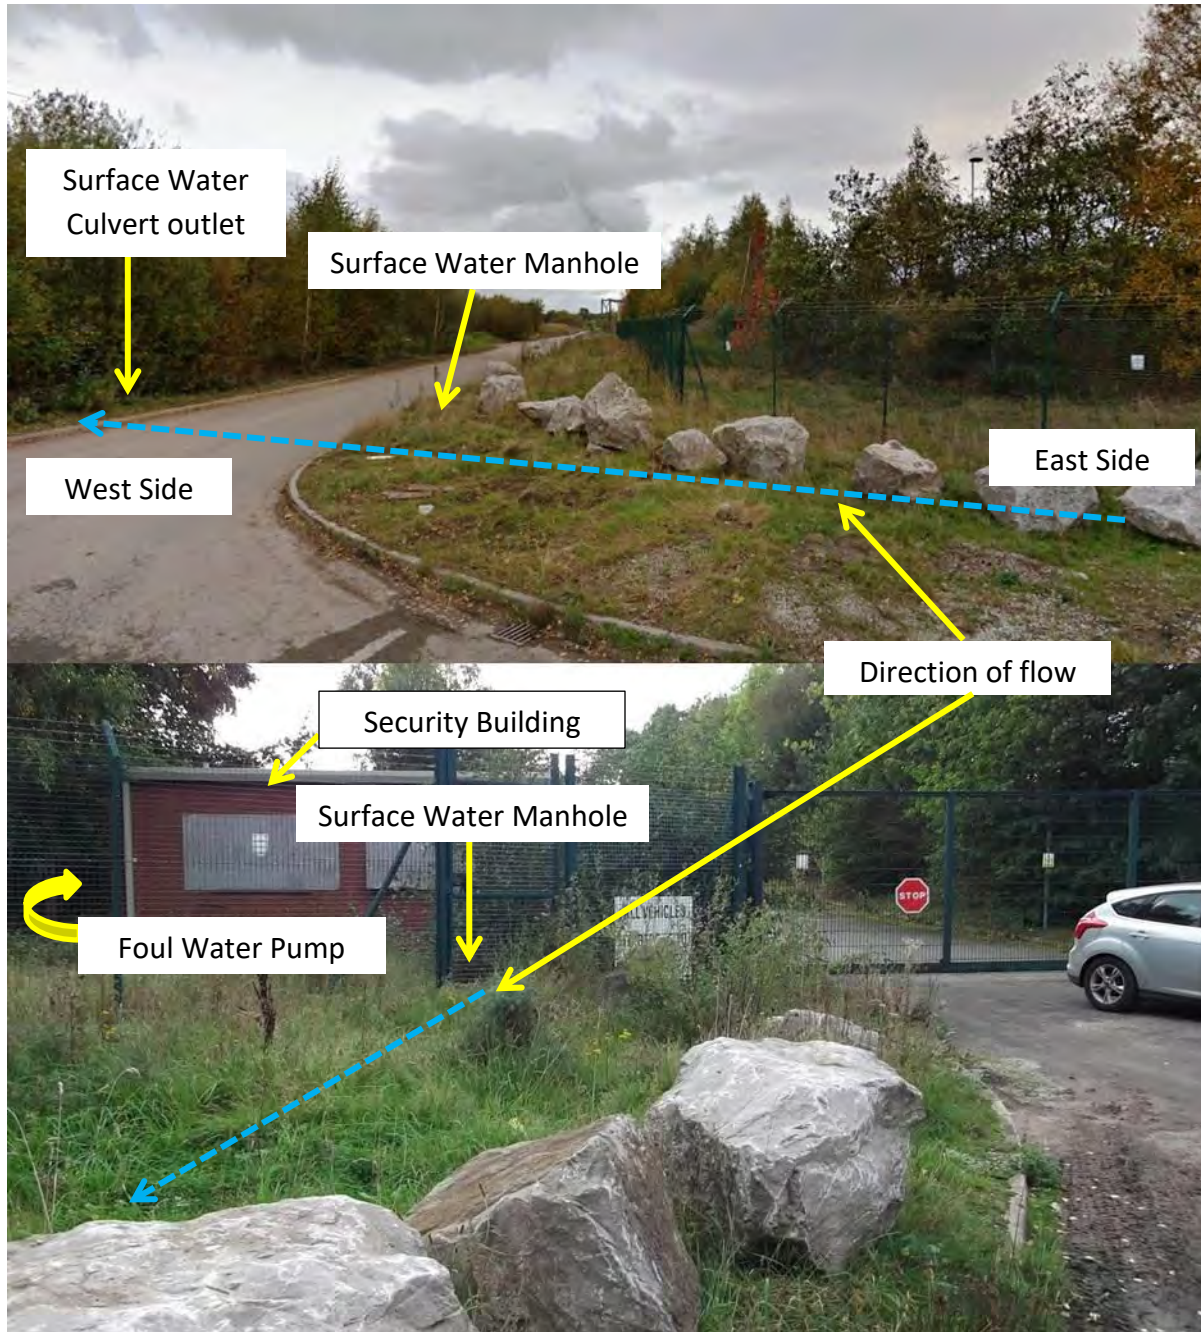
Looking westwards on to car park area with surface water drainage. Lateral gully drain present along the southern edge of car park.
